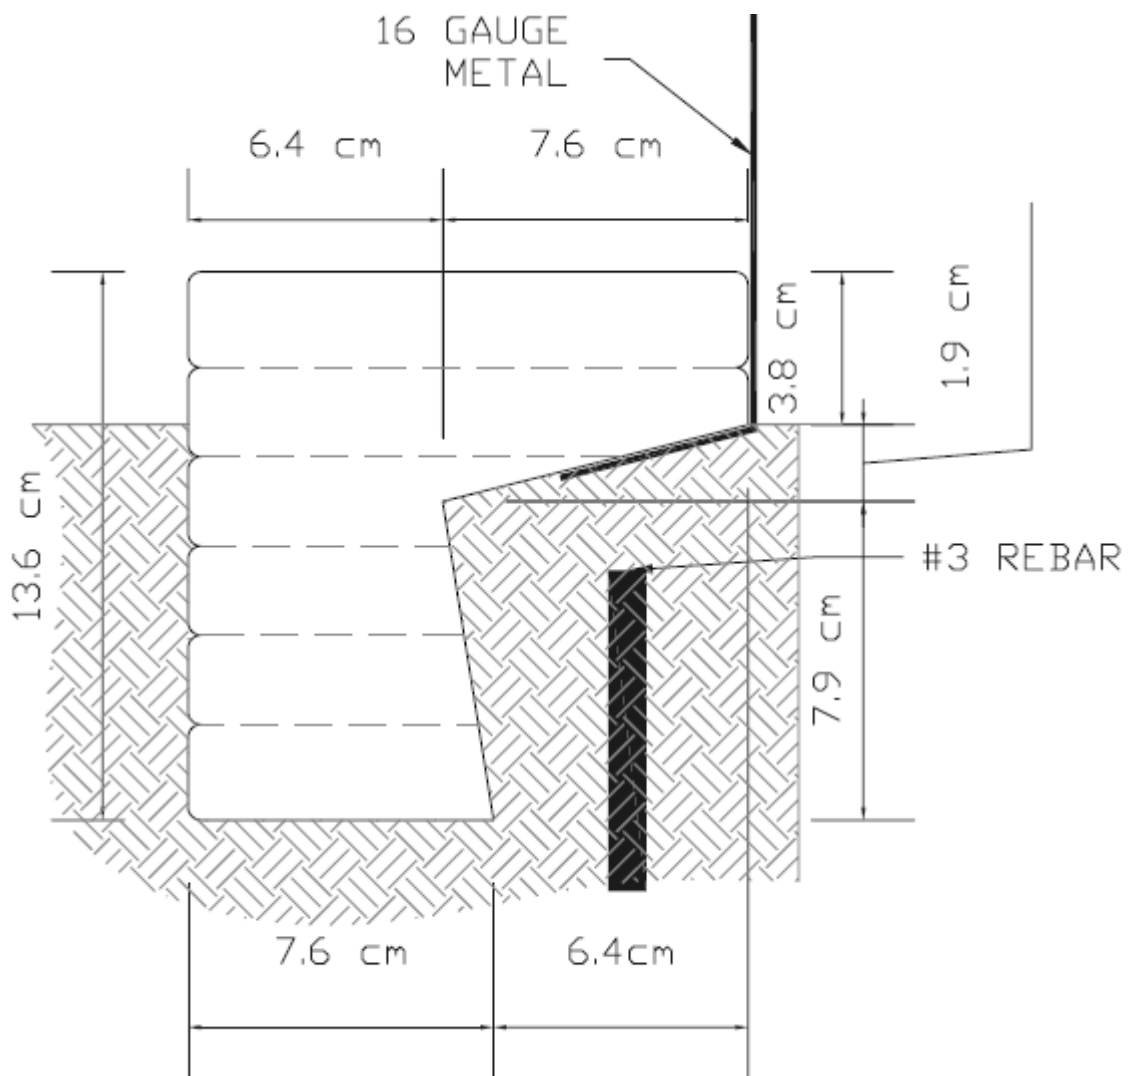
Restraint of uplift forces on the monotonic wall with a continuously embedded sill plate
